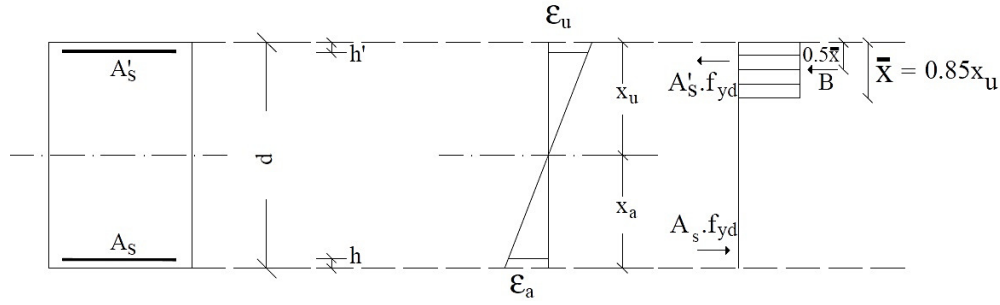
Reinforced concrete member with symmetric reinforcement.
